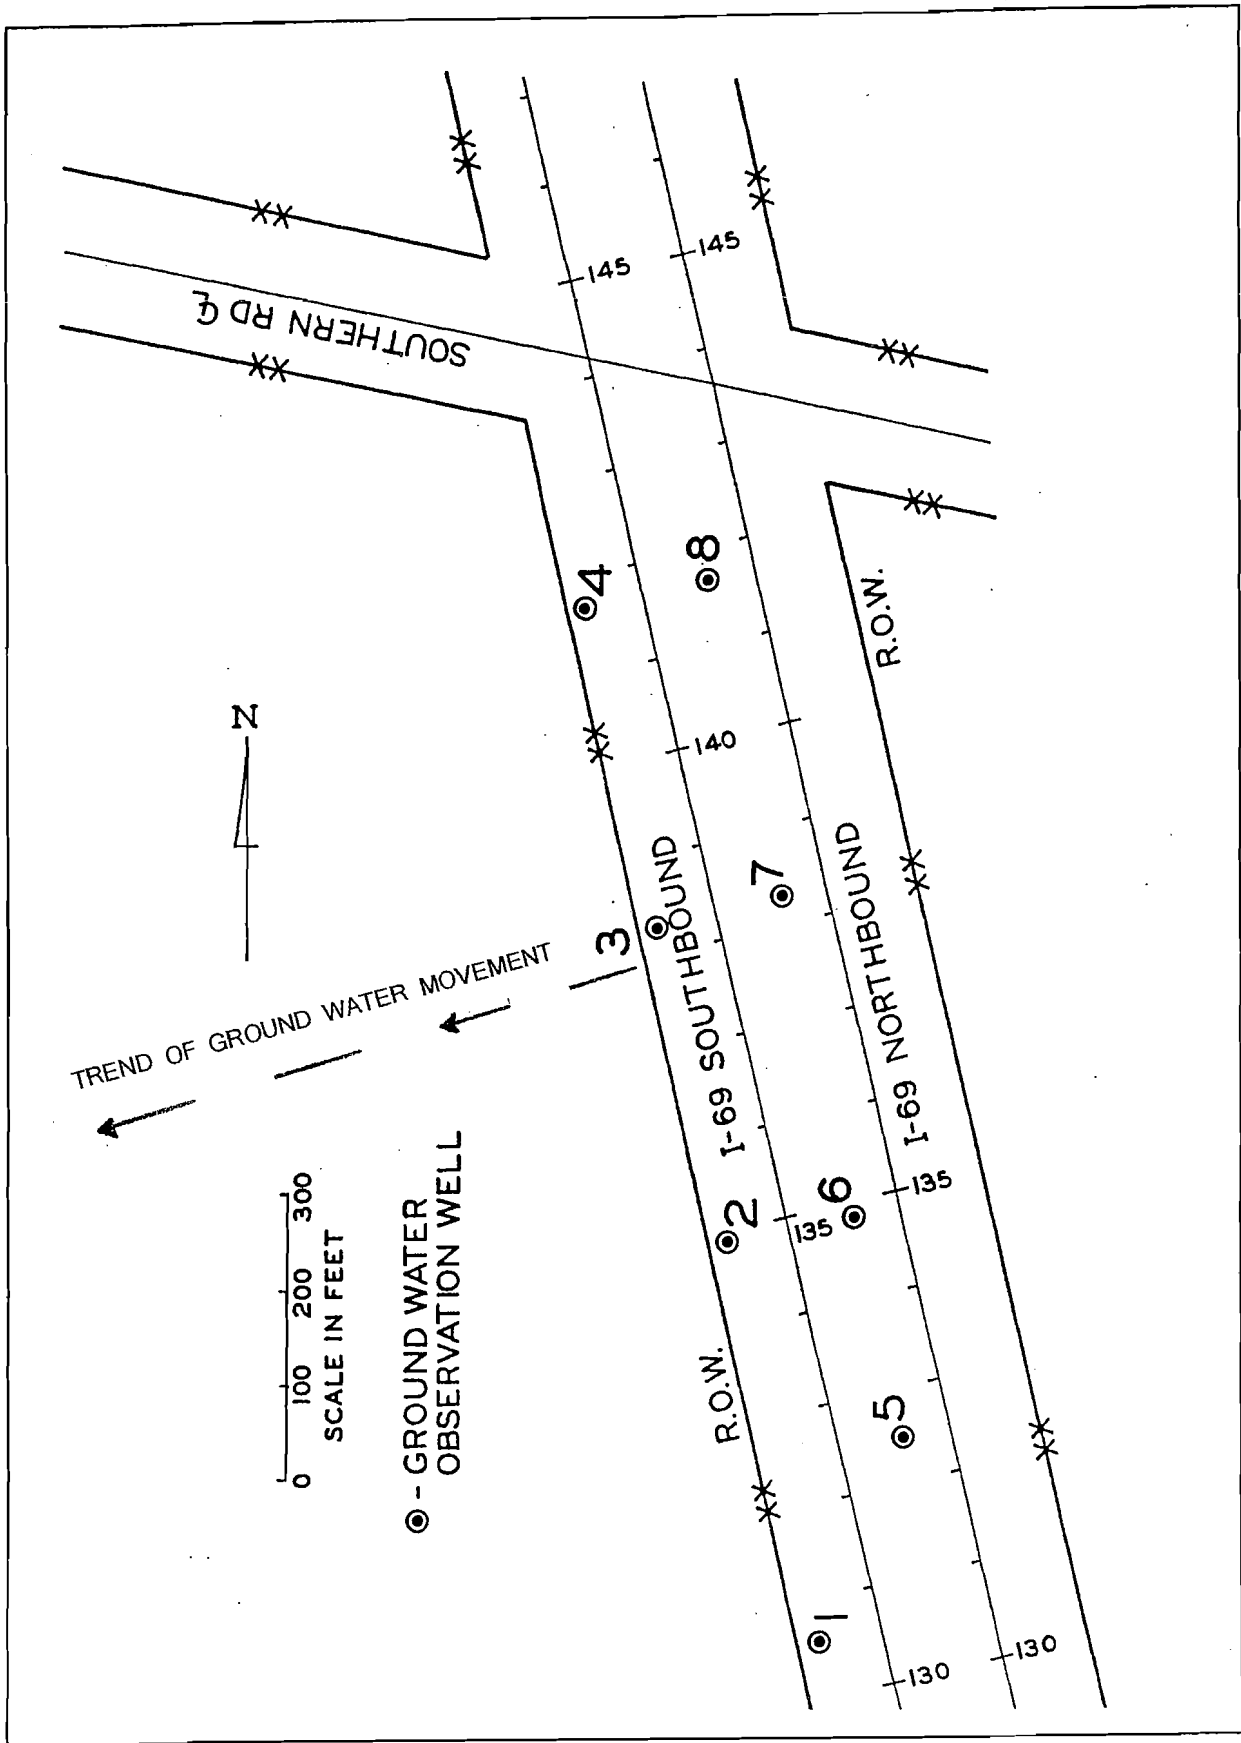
I 69 well locations, vicinity of Southern Road. Roadway opened to traffic in 1967.
